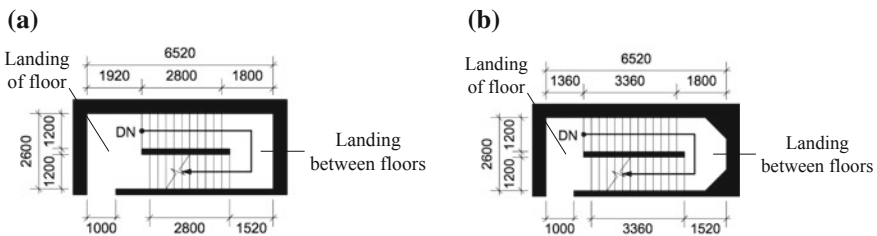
Plan [mm] of the staircase for (a) 4th to 25th floor and (b) 1st to 3rd floor
